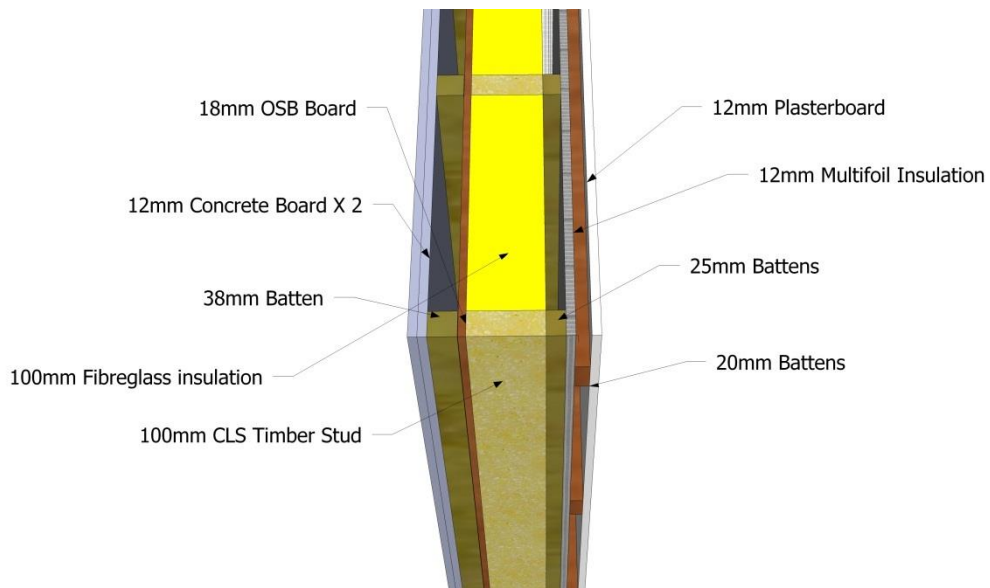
Section view of the build-up of the larger 140mm external wall panels
